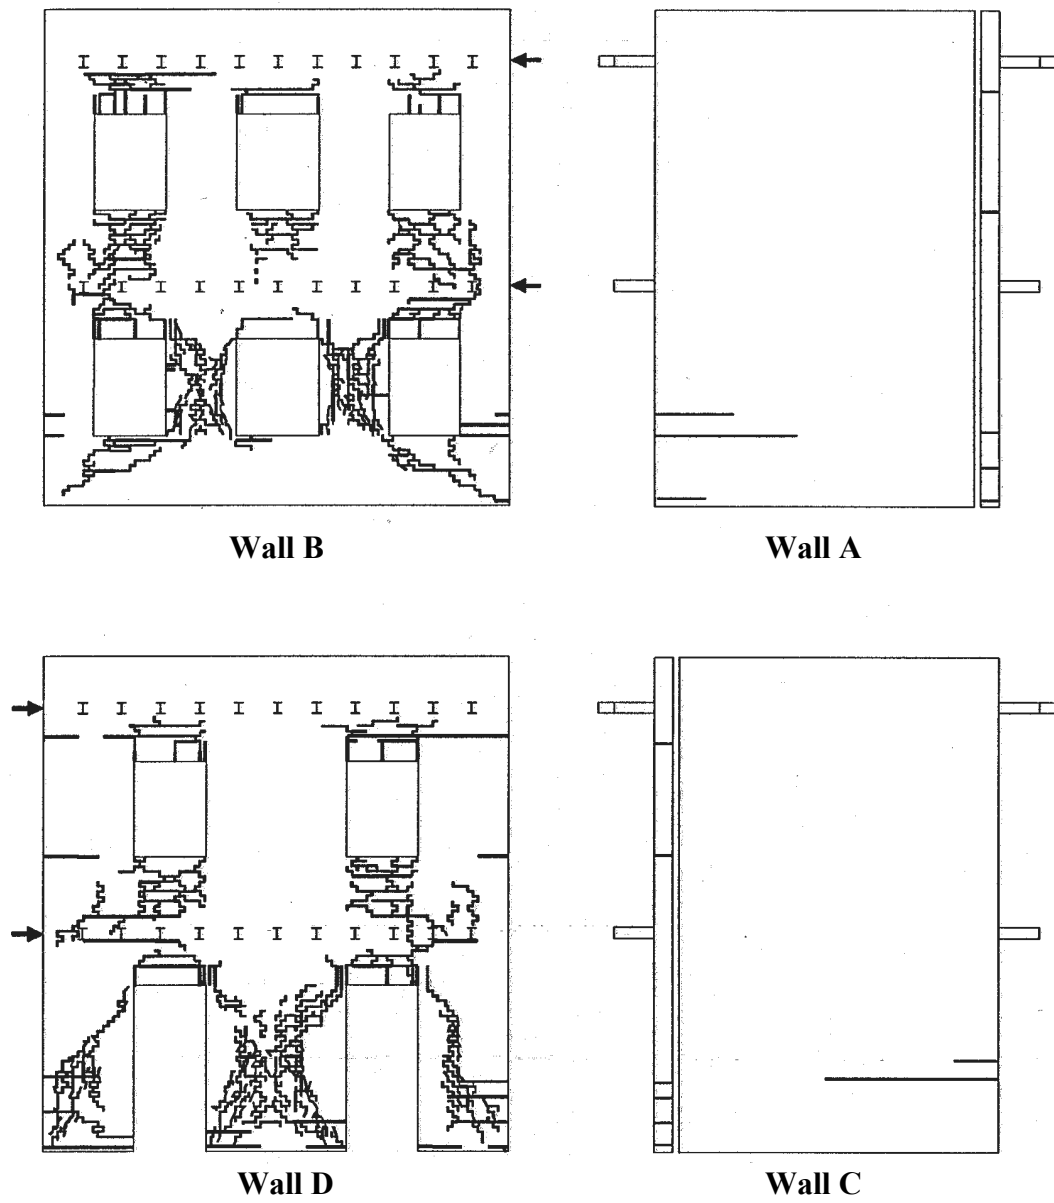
Final crack pattern in static tested specimen (Magenes et al. 1995)
